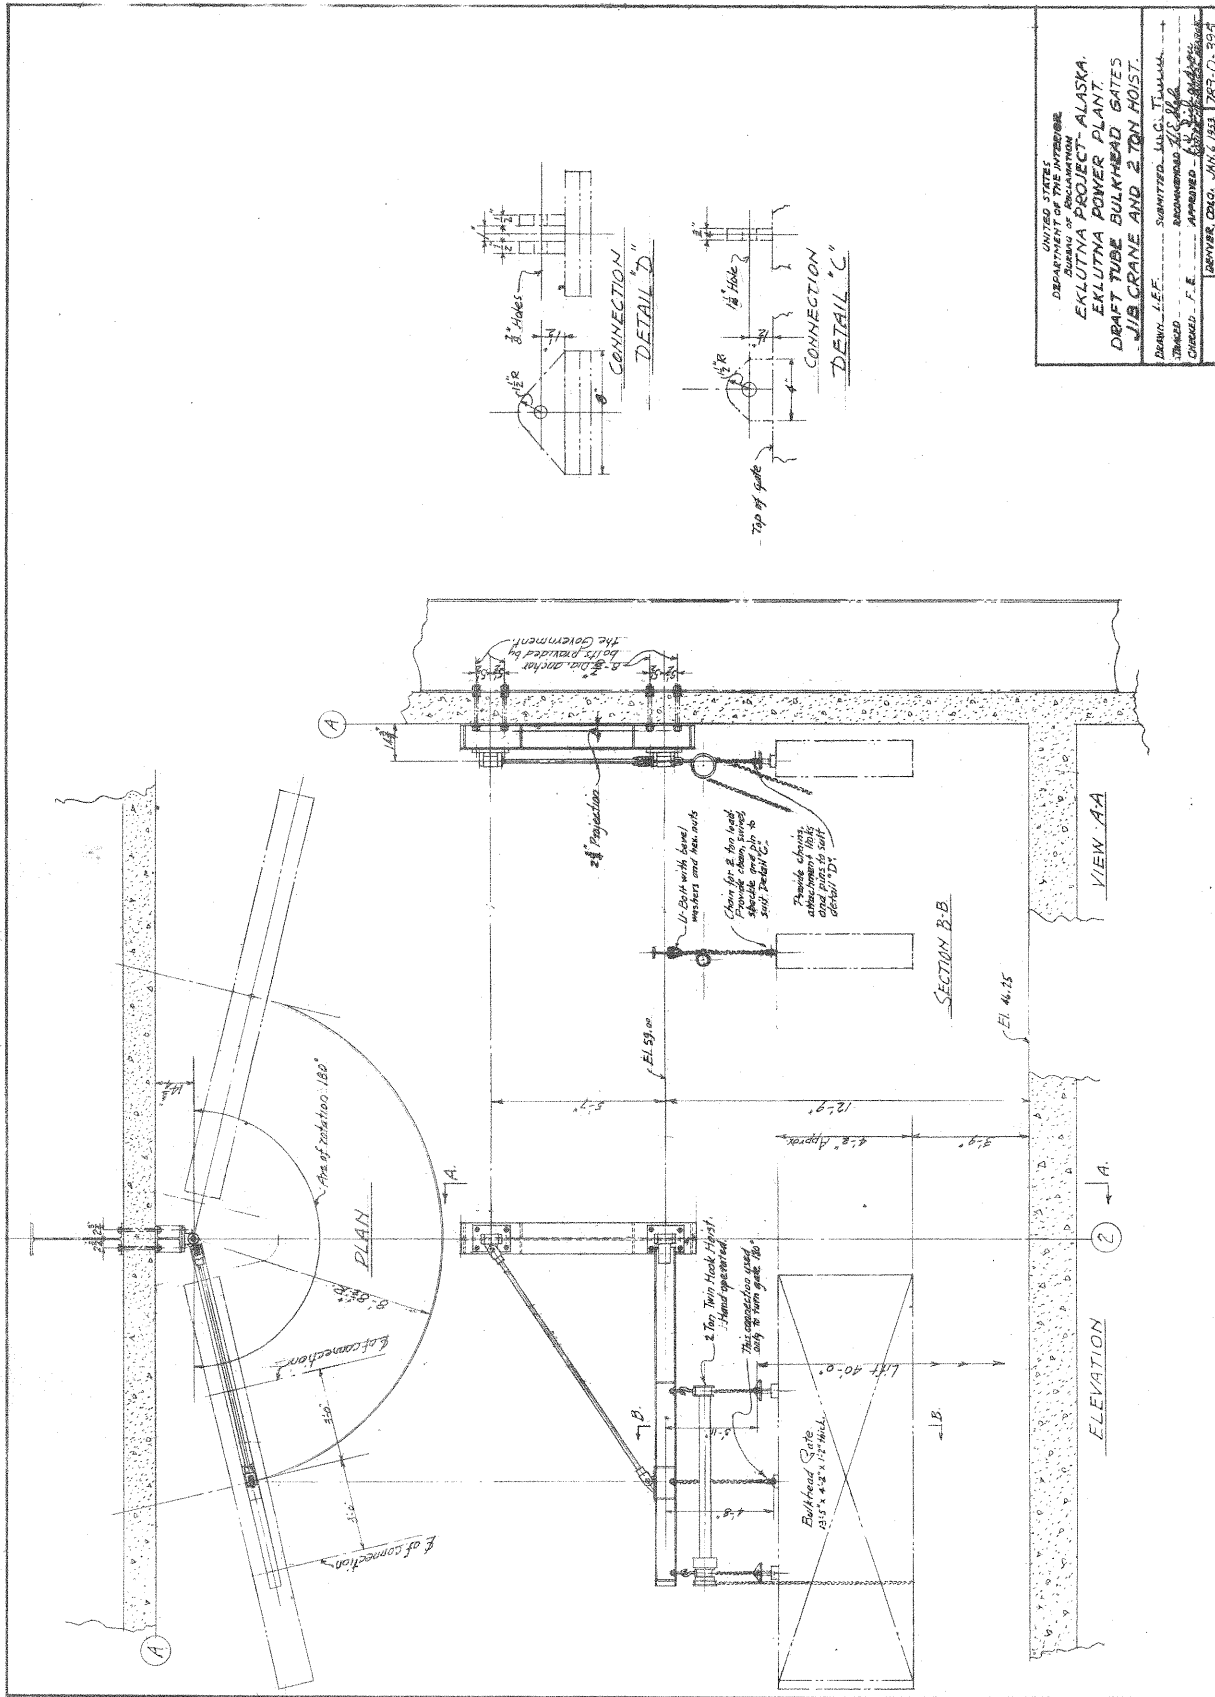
Jib crane and 2-ton hoist for draft tube bulkhead gates.
